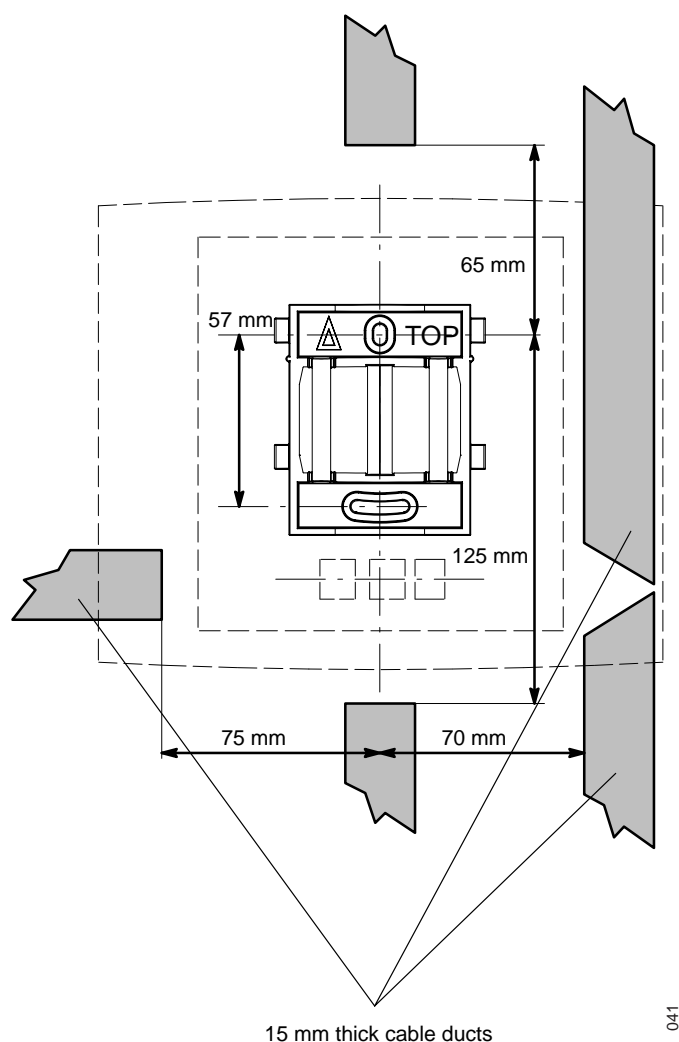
Minimum distances between a cable duct and the mounting bracket
